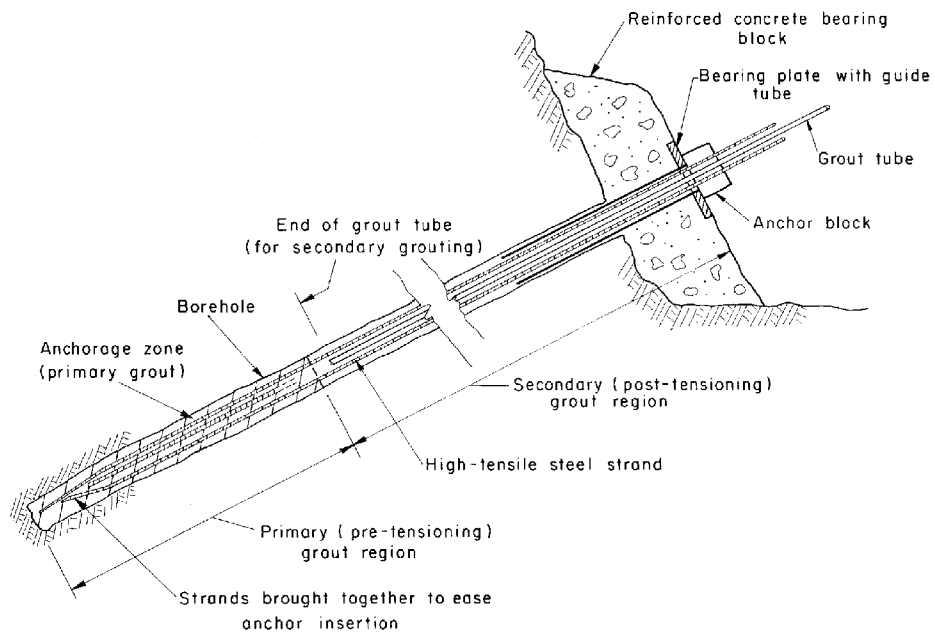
Typical cable bolt installation for slope stabilization (CANMET, 1977)
